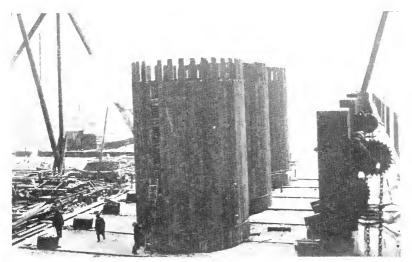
Caissons for fier 4 on Railway, Ready to Launch.
